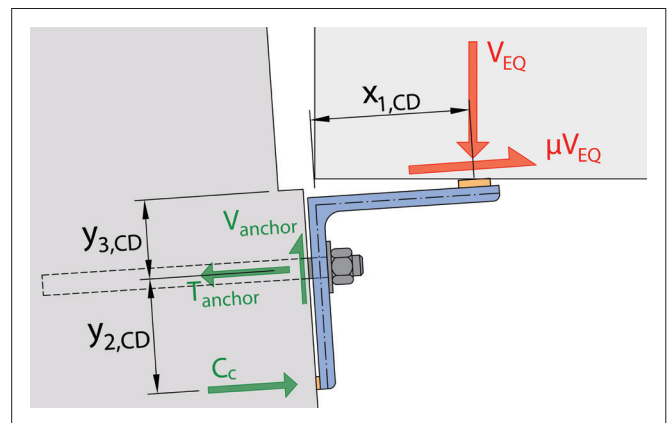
Forces in the post-installed anchors when the floor is sliding on the angle.
